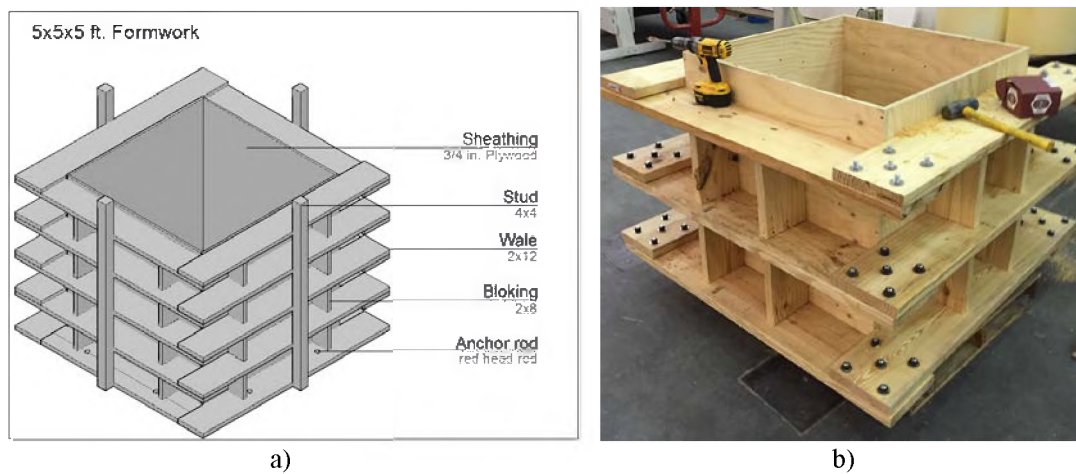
Mass concrete formwork: a) design, b) fabrication
